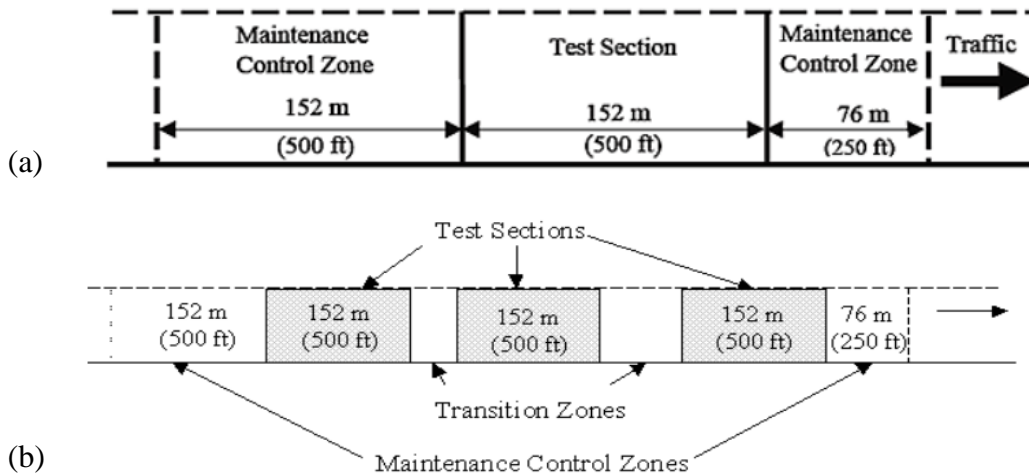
Layout of (a) GPS test section and (b) SPS test section (43)
